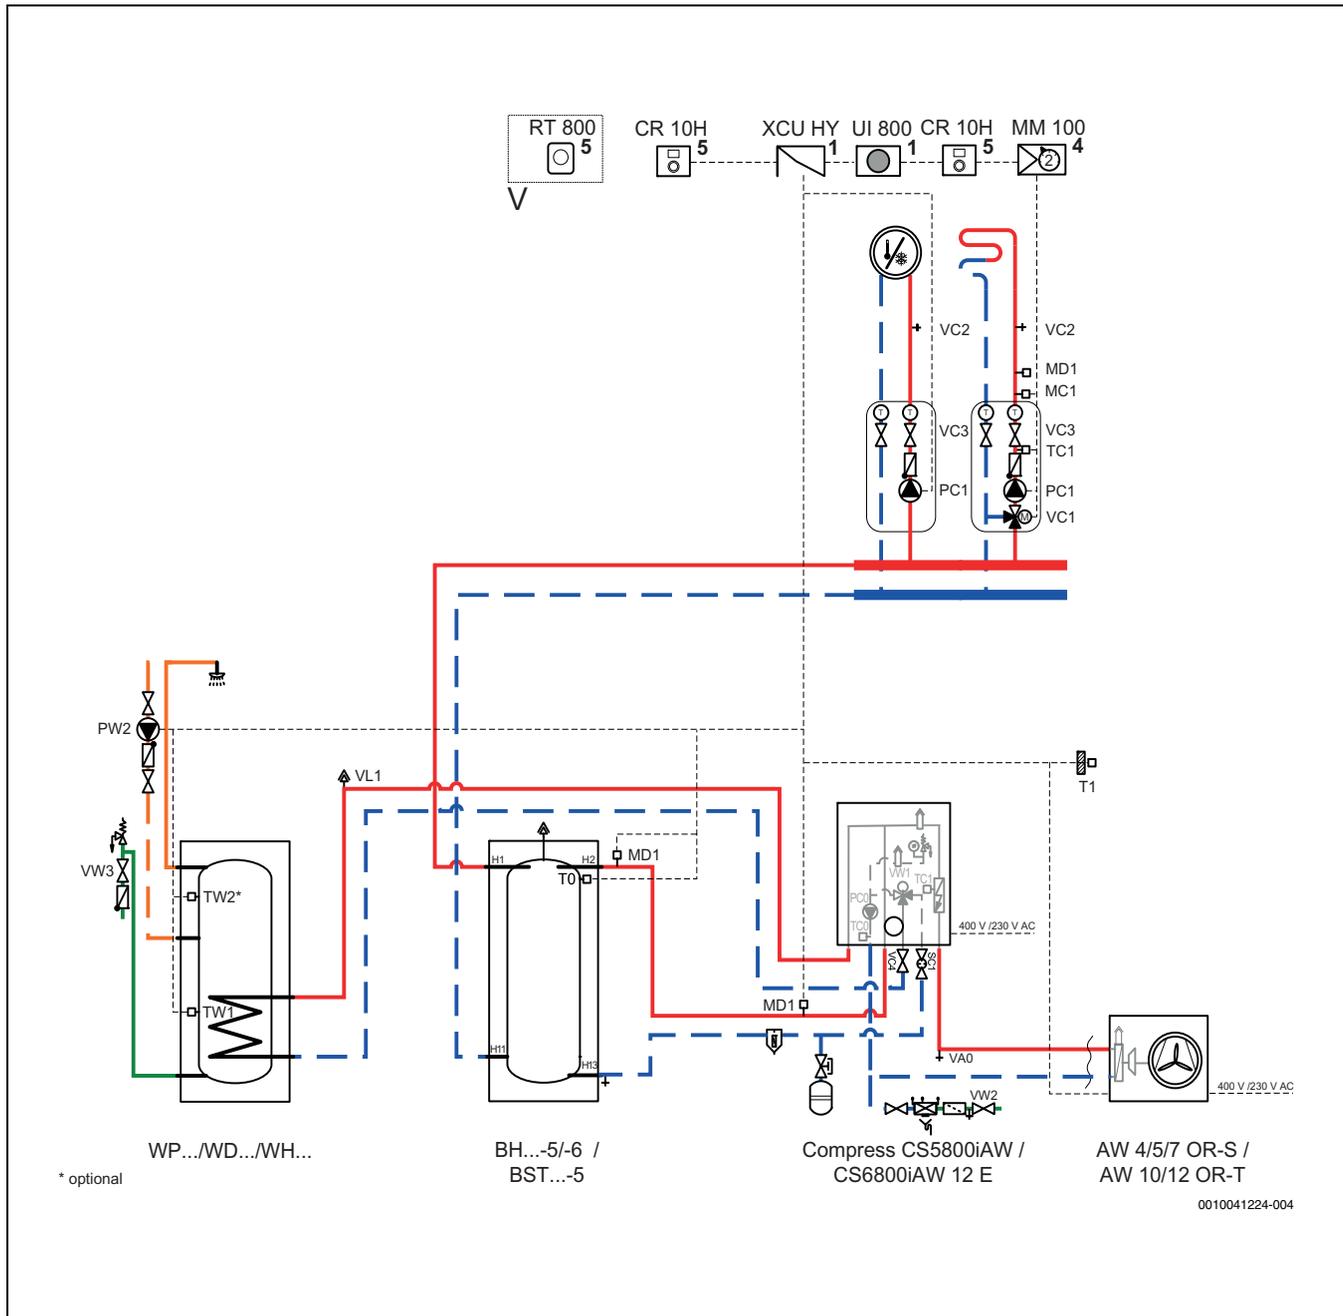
Heat pump, two heating circuits, indoor unit, buffer cylinder and DHW cylinder
